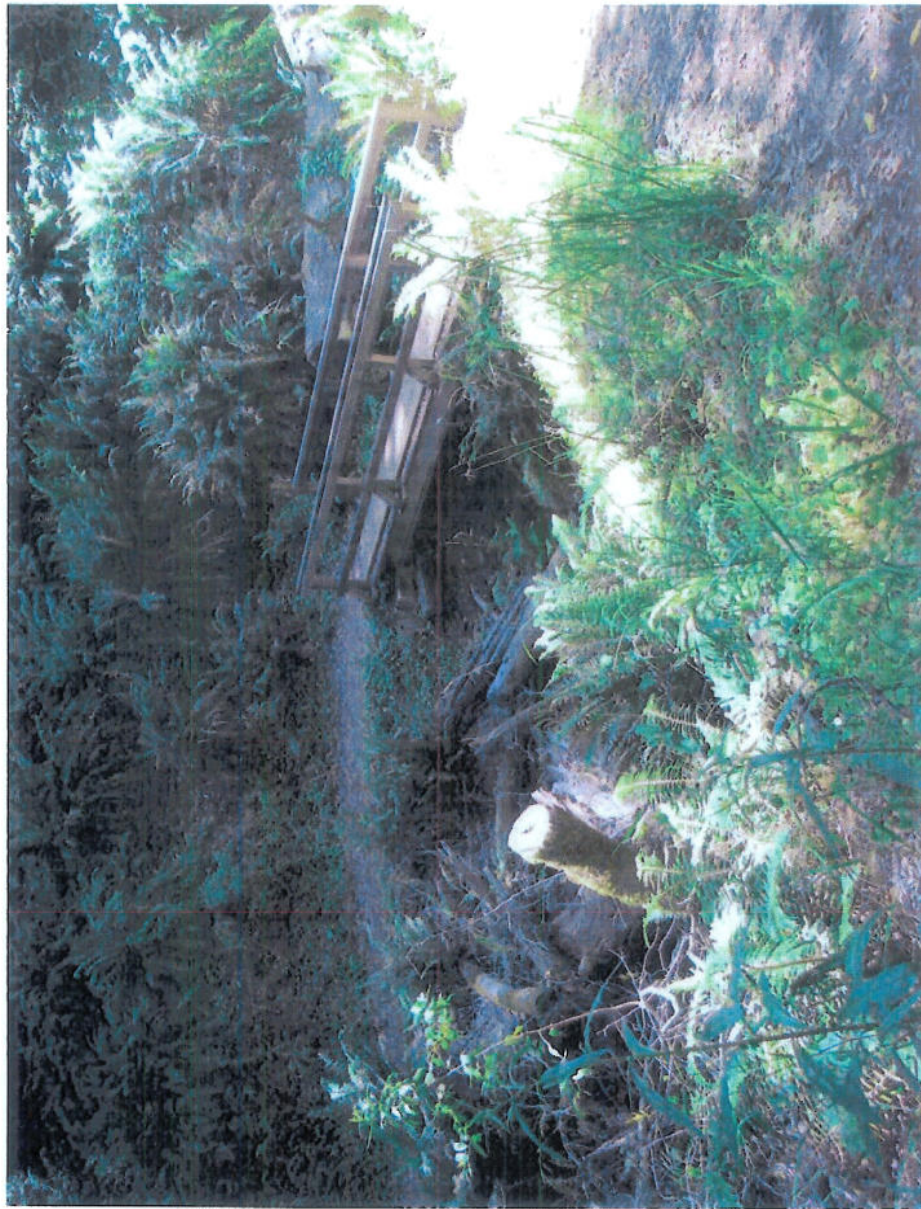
View of Bridge #5. Widening the trail through this turn may be difficult.
